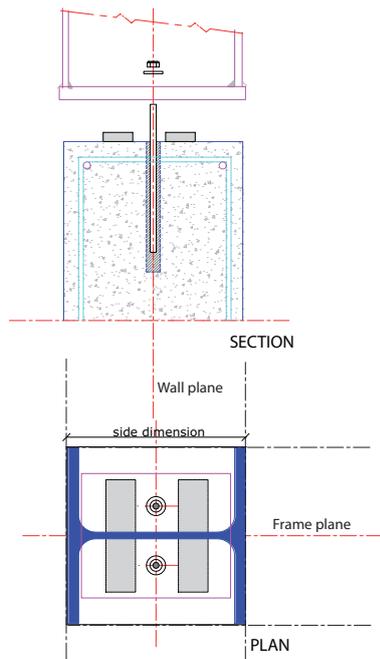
Pinned configuration on longitudinal wall (20 cm thick)
